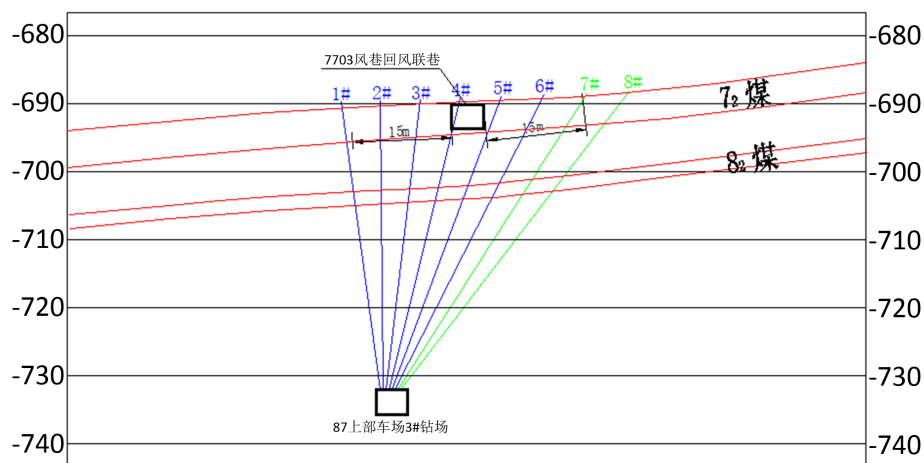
Design plan of drilling through the floor of 87 upper parking lot construction
